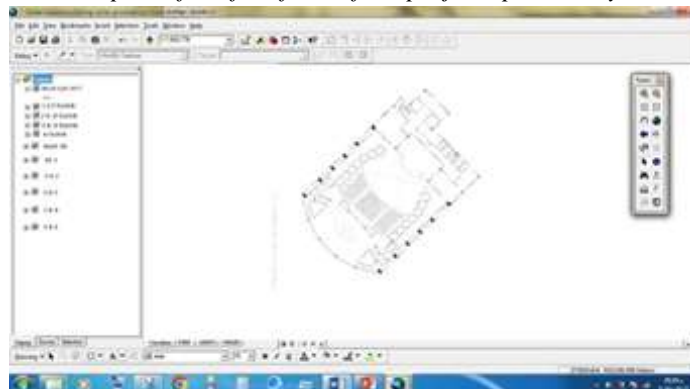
Horizontal plan of the first floor multi-purpose hall of the project uploaded by the engineer.
